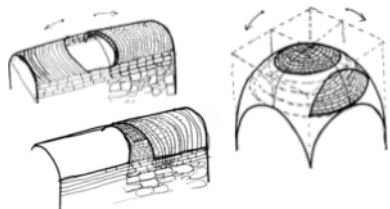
Scheme of the constructive systems of lowered barrel vault (left) and sail vault (right) (author's drawing).
